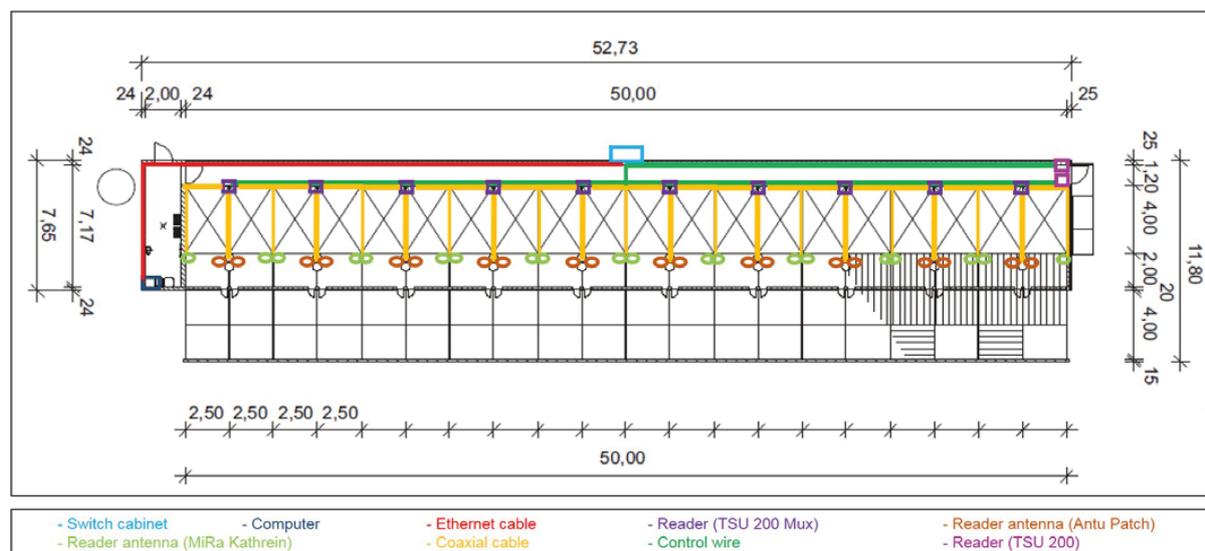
Plan elevation of example barn A for 400 fattening pigs with schematic illustration of the inbuilt RFID system hardware components (© KTBL 2015a, adjusted)
